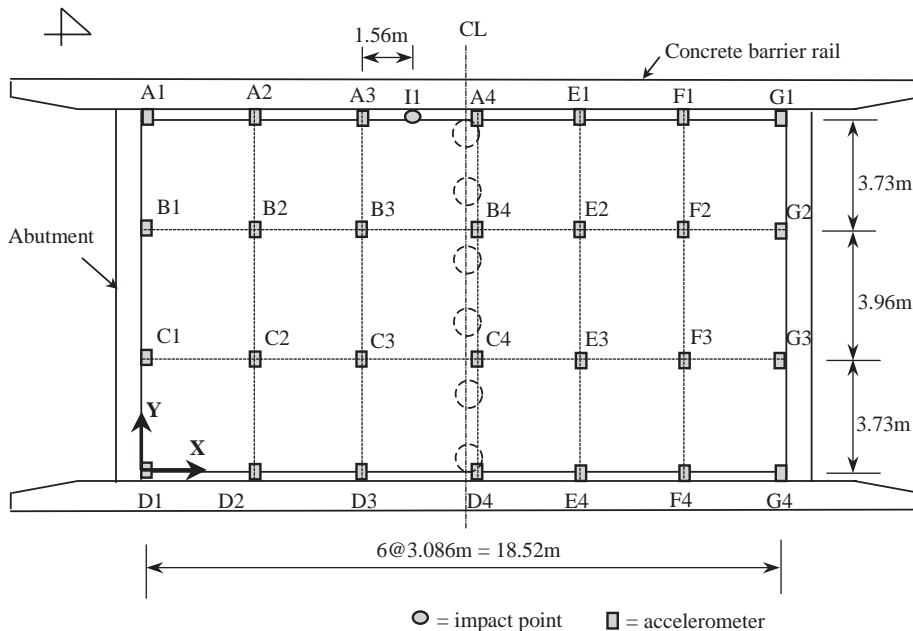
Plan view and sensor layout of King Storm Water Bridge.
